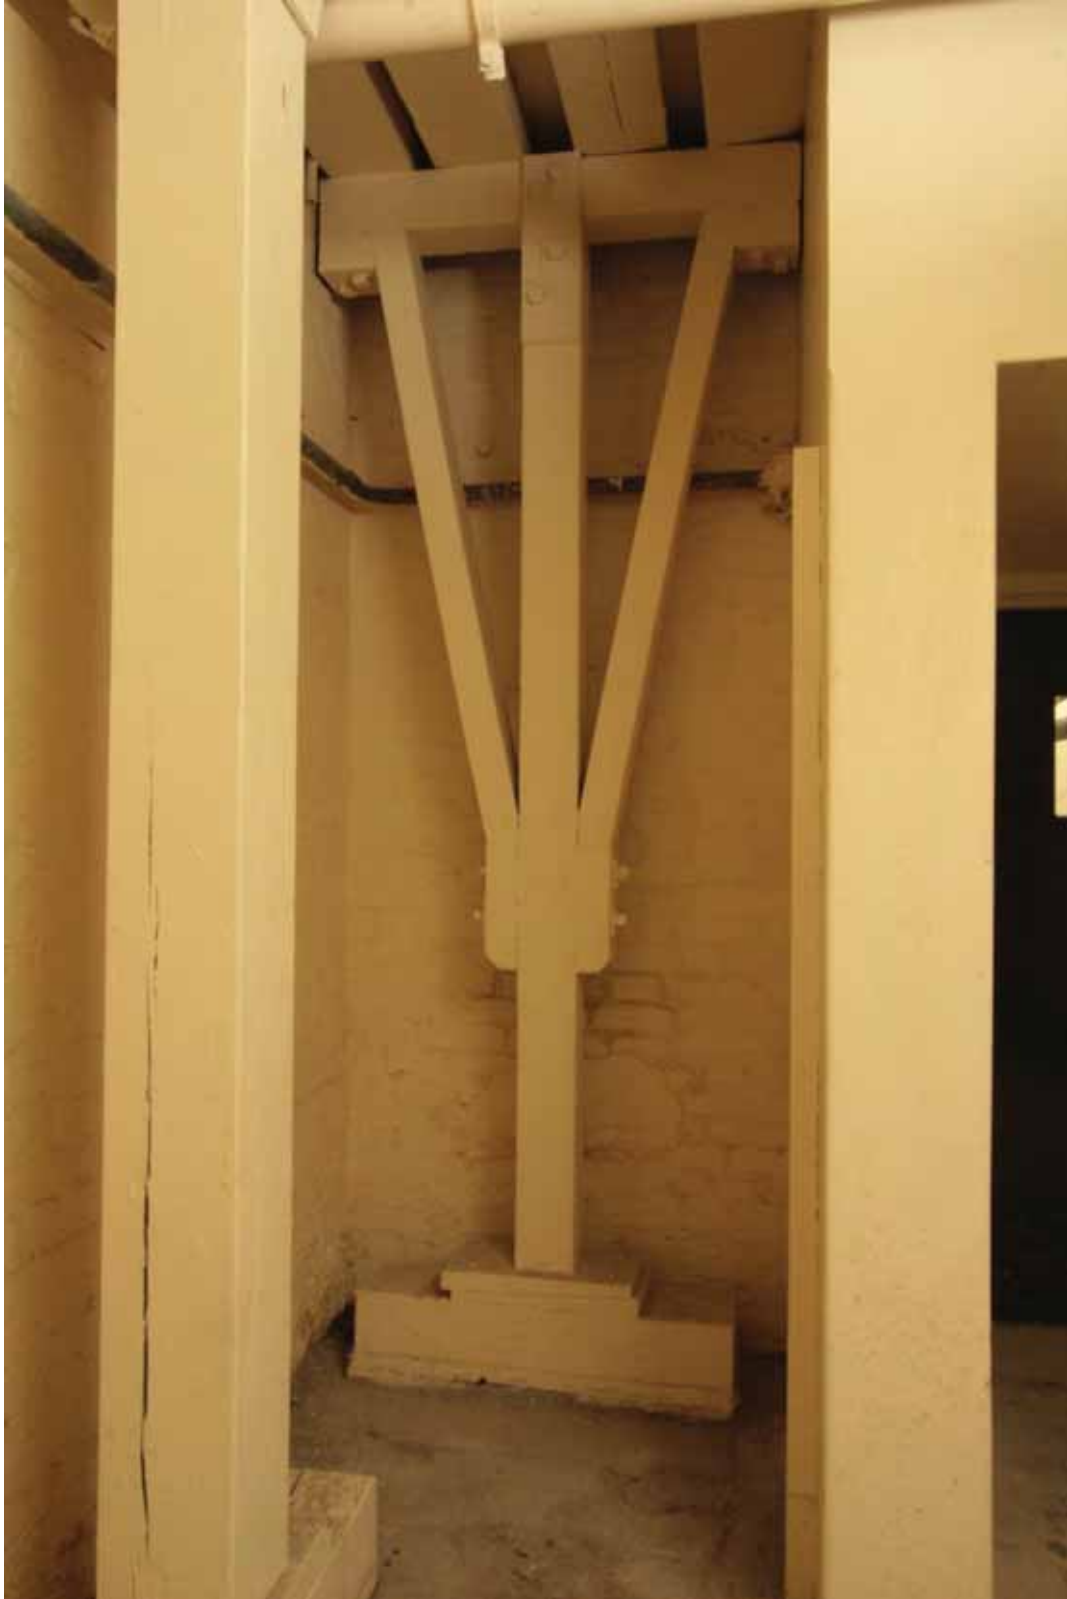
World War Two timber shoring on the east side of the south doorway in Room B63, looking south (EAF10 D100 002)
